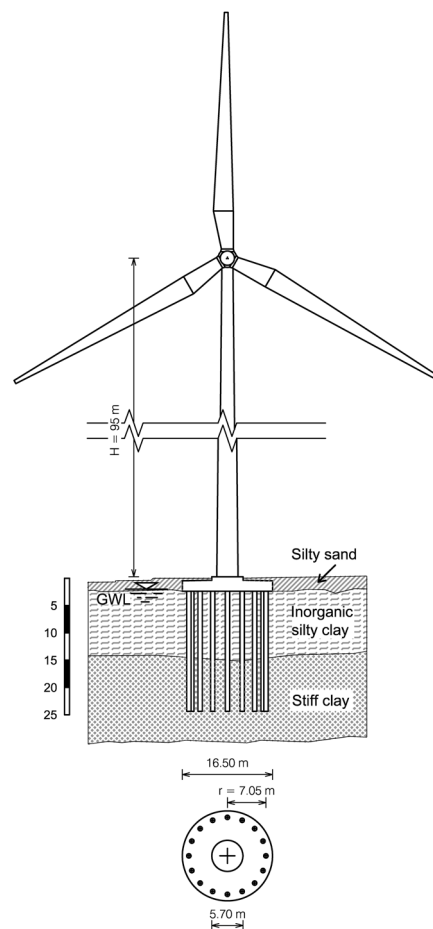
Plan view and cross section of the piled foundation of the wind turbine under examination
